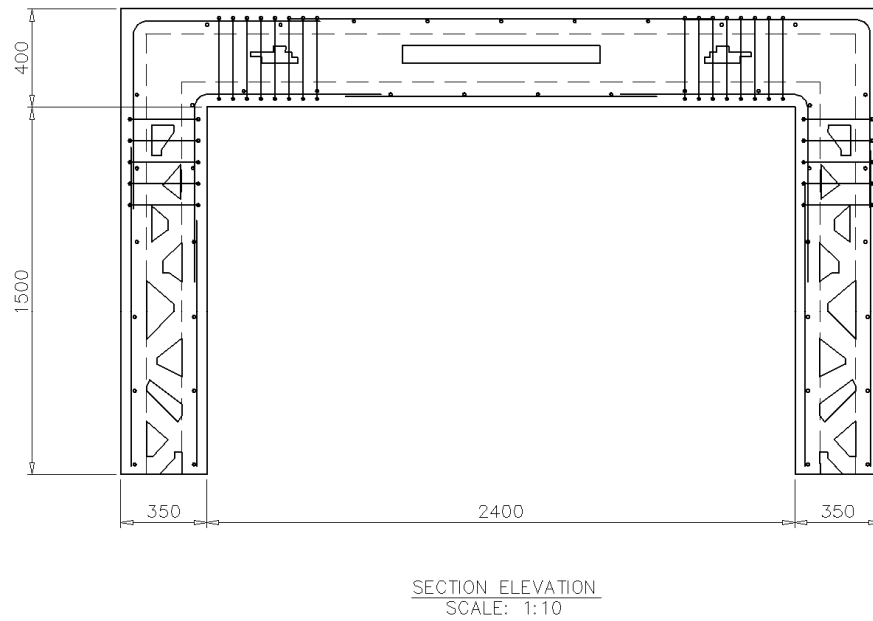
Optimised 2415 RCBC with trimmed voids and reinforcement
